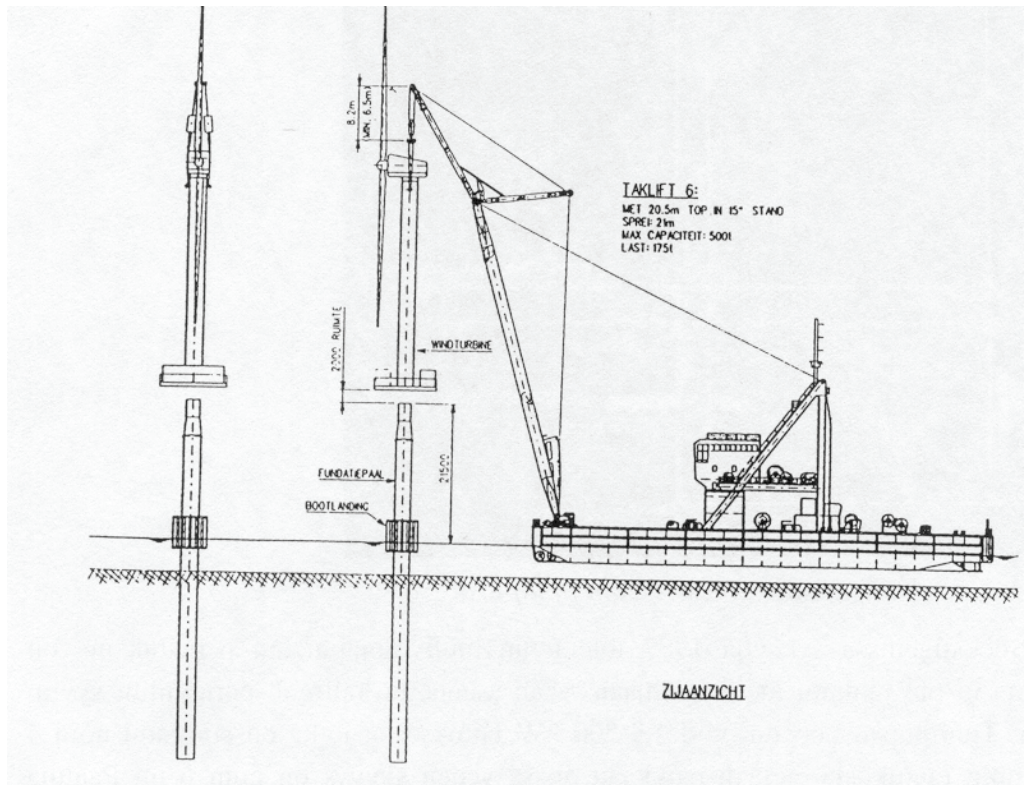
Wind power plant erection with rammed pile foundation (Holtinen et al. 1998).
